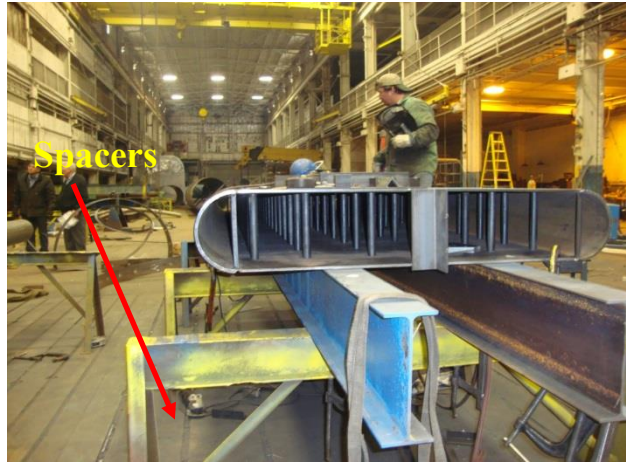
Assembly of CFFSP-NB1 Specimen
